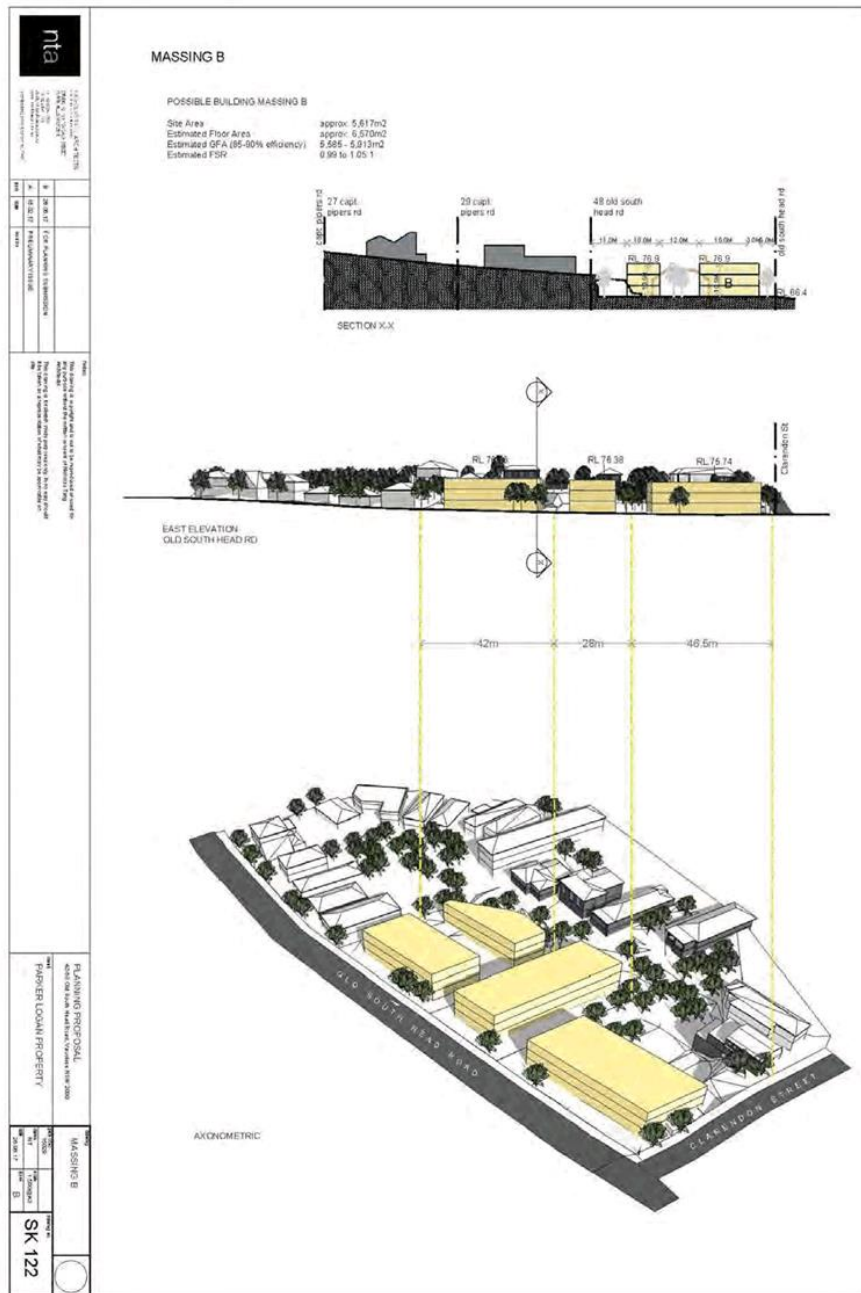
Building massing concept B (source: Nicholas Tang Architects)
